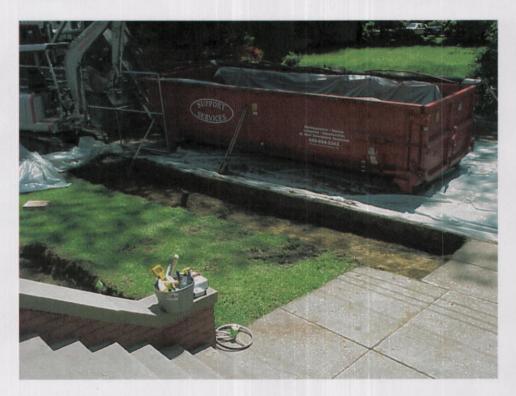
View looking southeast showing completed excavation along Lee Avenue.
